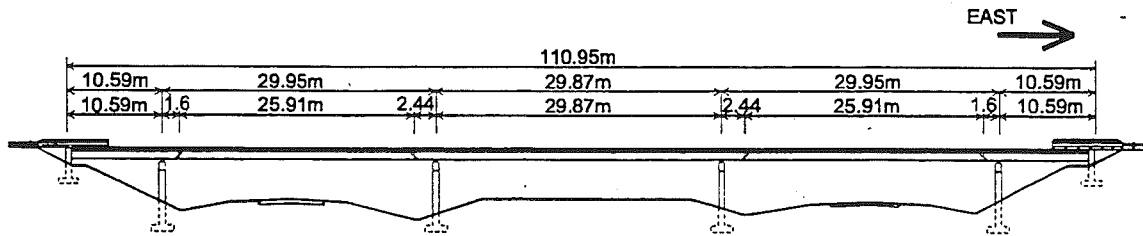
The Elevation of Bridge NDN/I69 (S03-13074).
